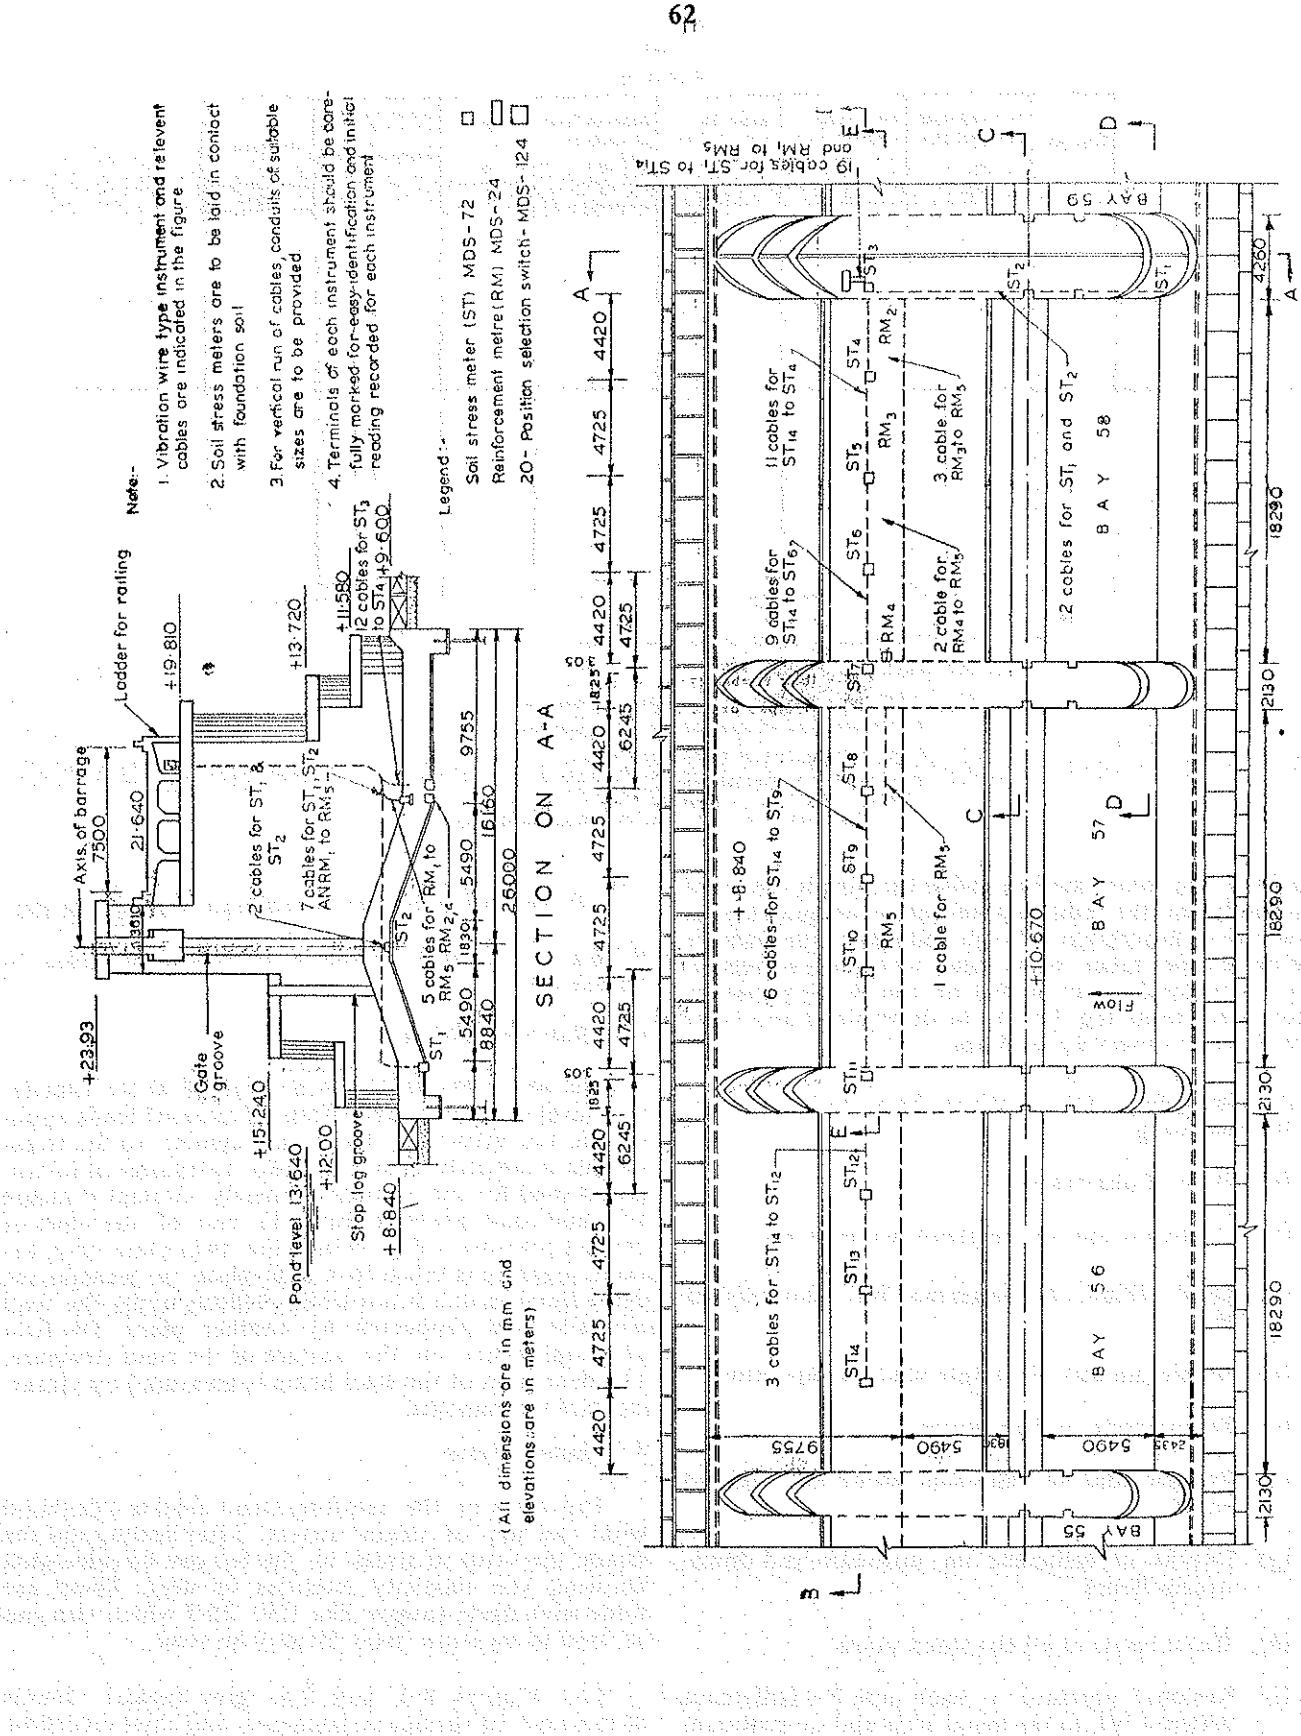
Typical Details of Location of Instruments and Recording Point.
